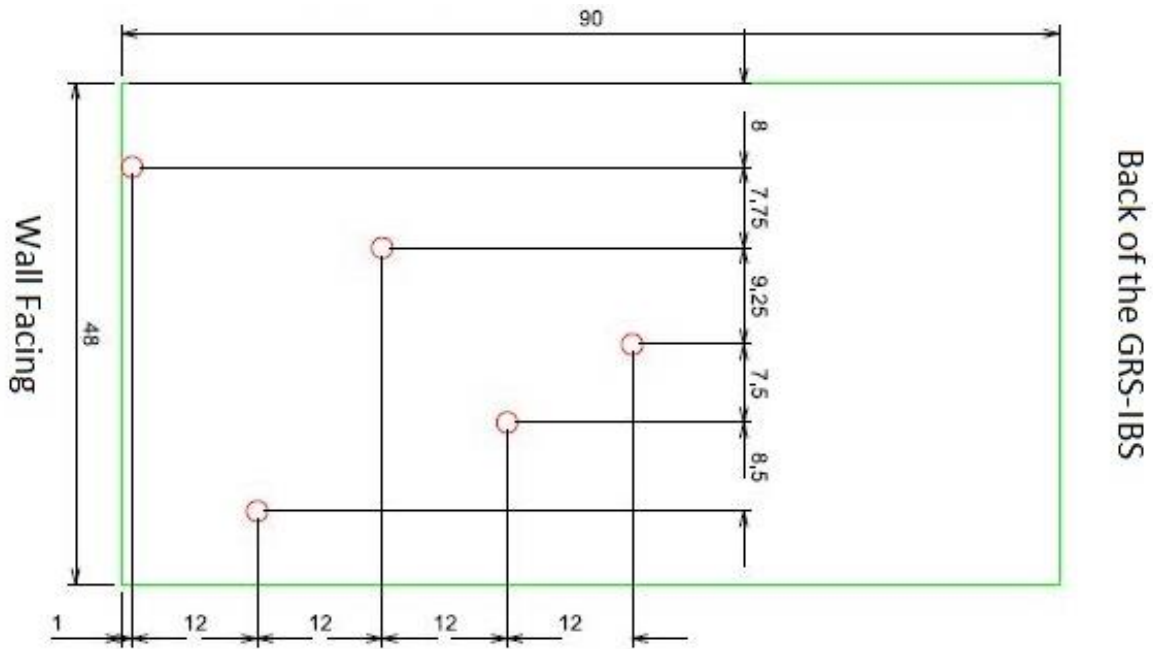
Plan view of WP connections to geotextile reinforcement at H = 87-inch above the foundation slab of GRS Abutment Models #1 and #3 (dimensions are in inches)
